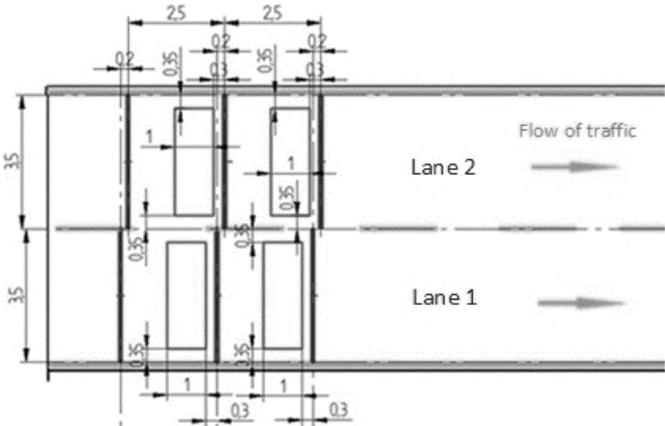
Typical single-line layout featuring 12 quartz sensors and 4 loops
